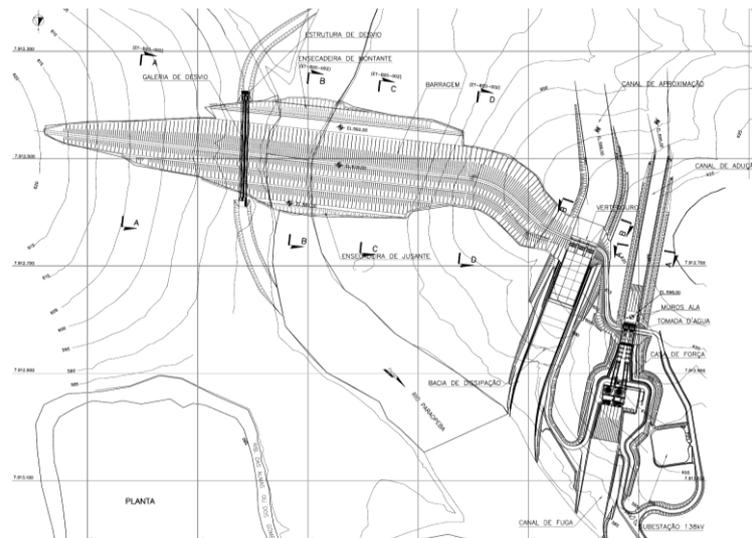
Layout of Retiro Baixo Hydropower Plant.
